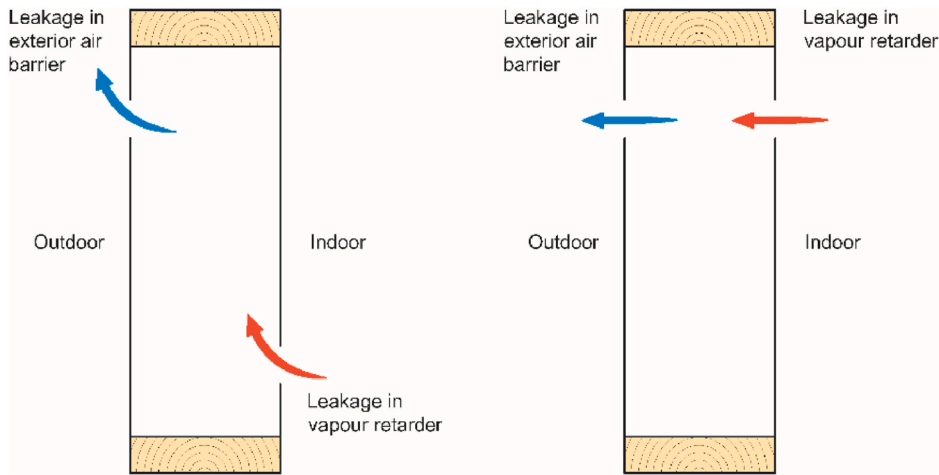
Cross section showing the intended leakage path for moist indoor air in wall sections 1–4 (left) and wall section 5 (right).
